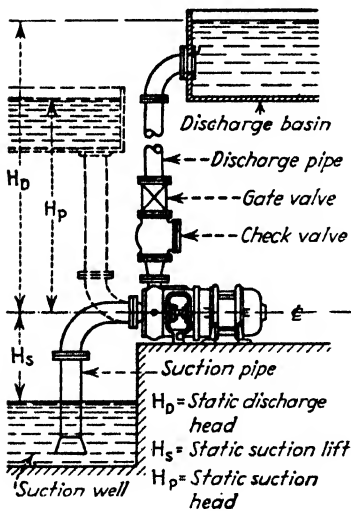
The meaning of head on a pump. (Ingersoll-Rand Co.)
